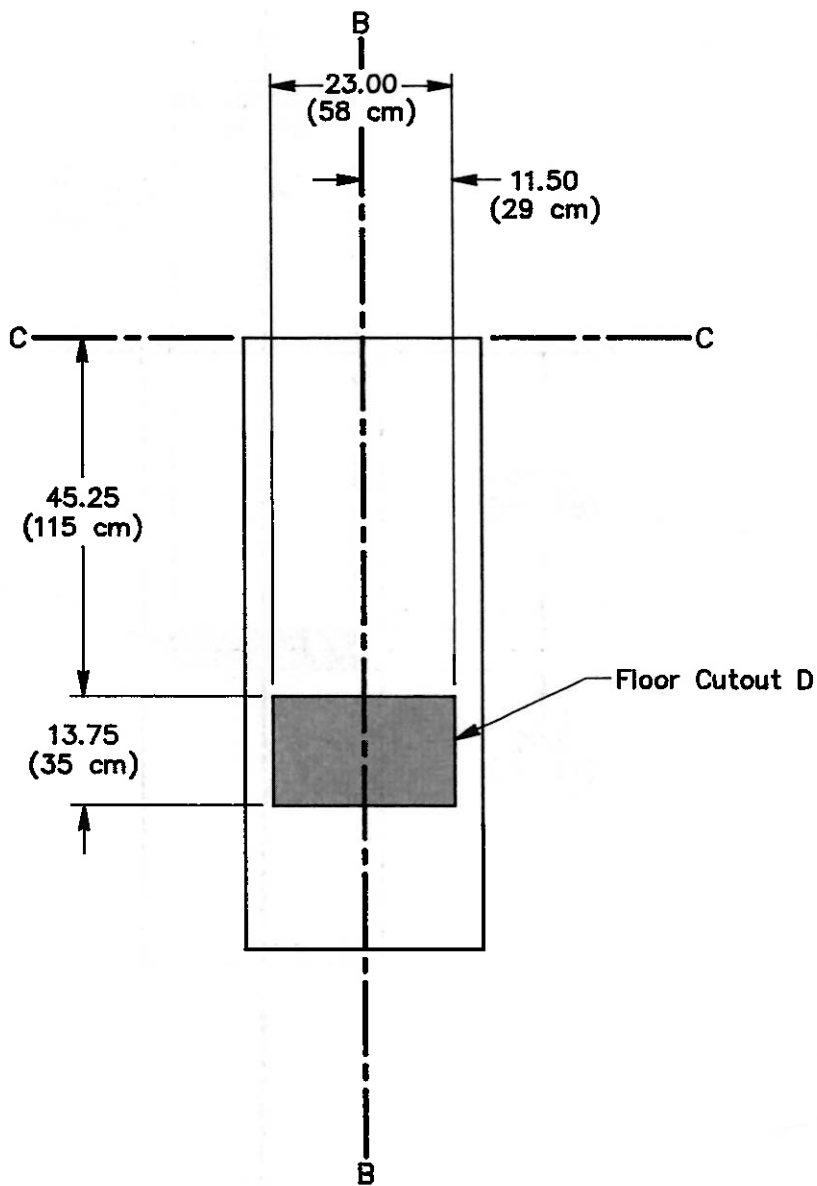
Location and Dimensions of MFC Floor Cutout D
